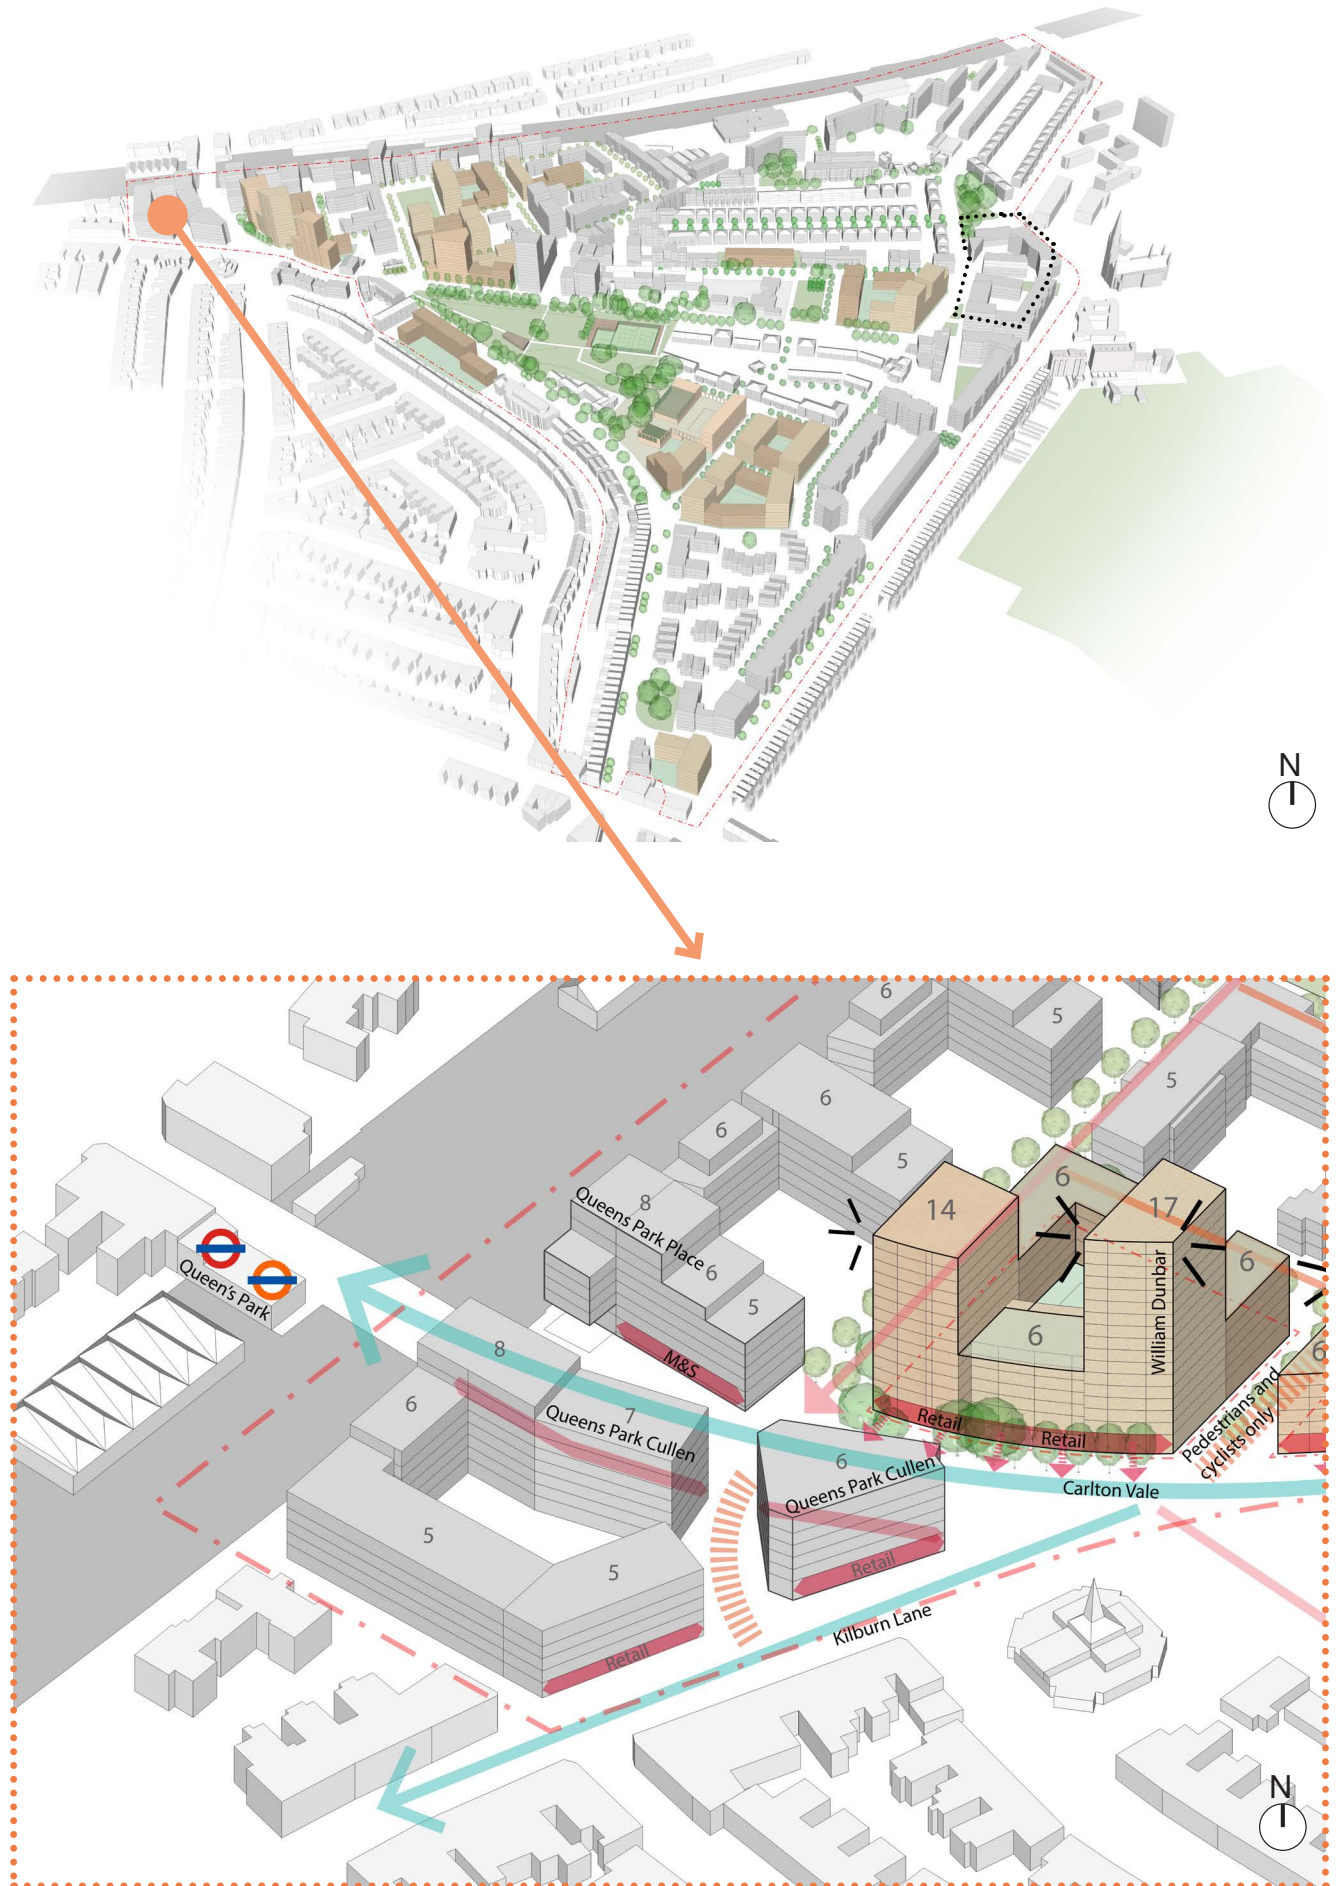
Massing drawing with outlined Queen's Park & Cullen House
